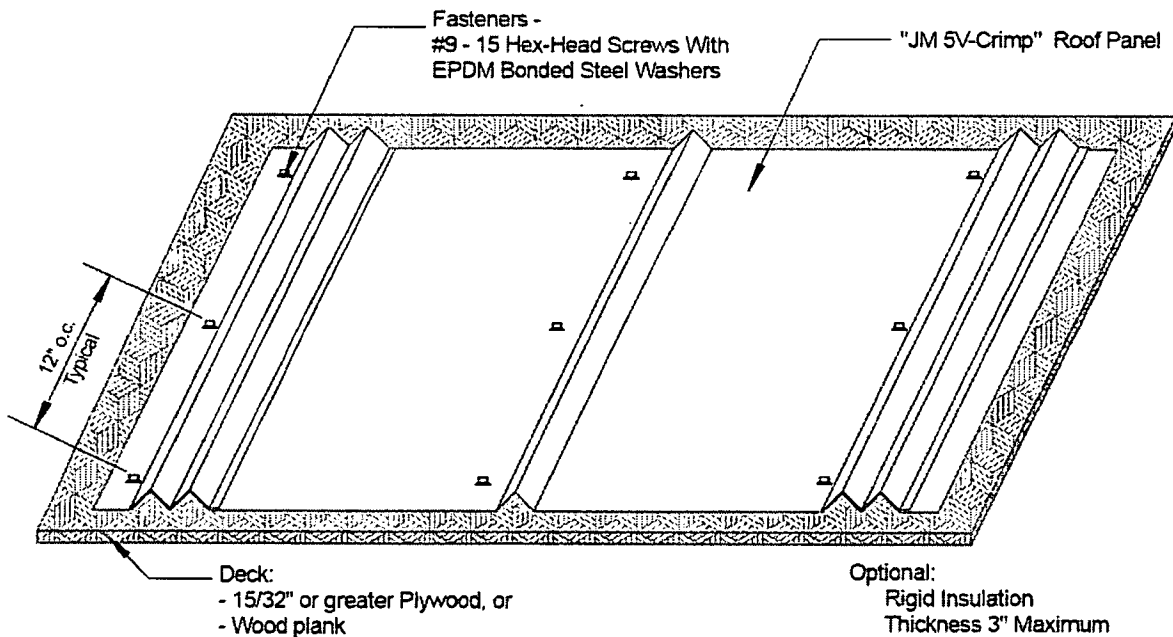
B - Typical Assembly Isometric View (METHOD 2)
